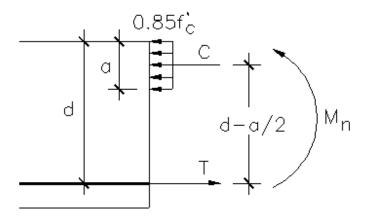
Tensile and compressive forces and stresses on a footing section
